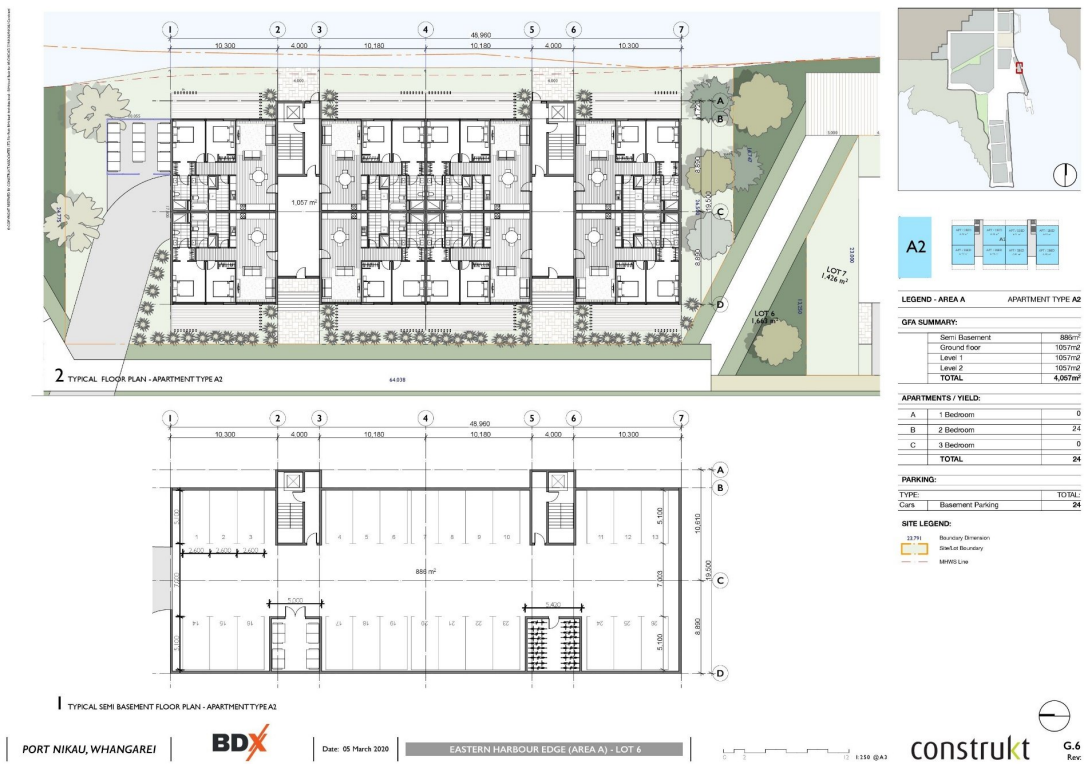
Part G – Eastern Harbour Edge (Area A) Floor Plans
